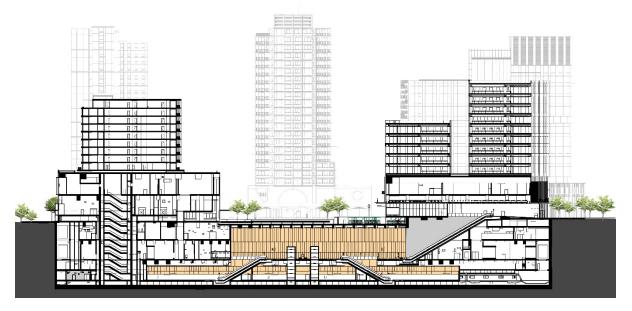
Longitudinal cross-section of the Waterloo metro station
